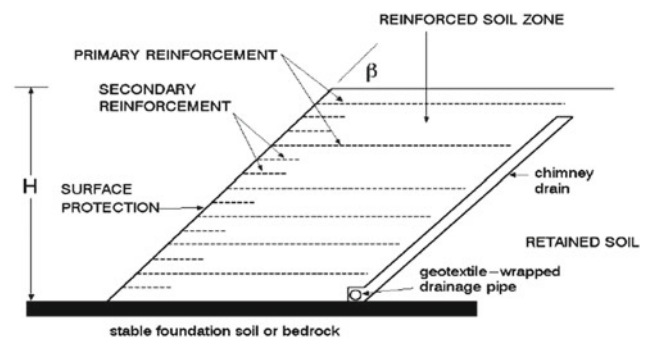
Scheme of a geosynthetic reinforced soil slope (from IGS leaflet “Geosynthetics in Slopes over Stable Foundations”)
